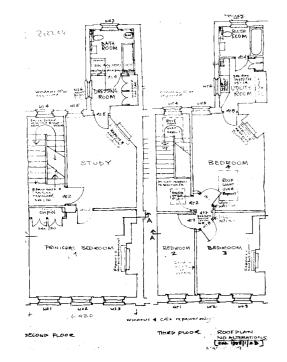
Proposed 2nd & 3rd Plans Application PSX0304159
